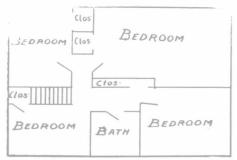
In the above plan, long closet door should be more to the right to come within the bedroom. A slight mistake was made in the cut.
